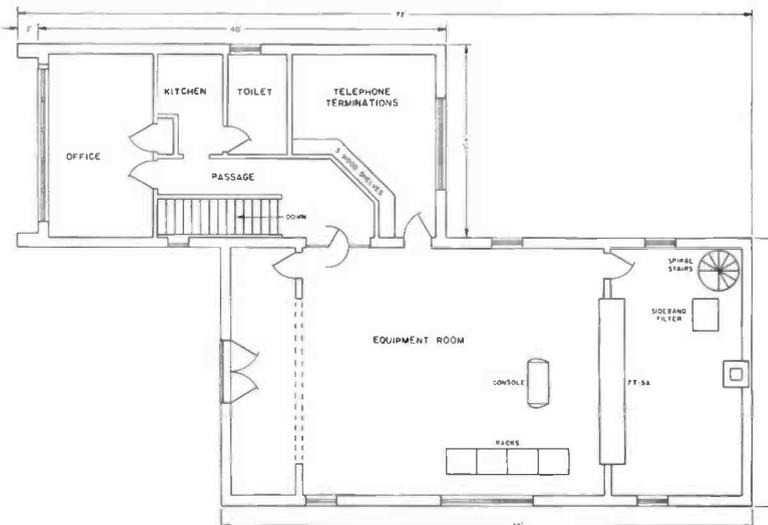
This floor plan shows the arrangement of the flush-mounted TT-5A transmitter, the sideband filter, the racks, and other facilities of the transmitter building.
